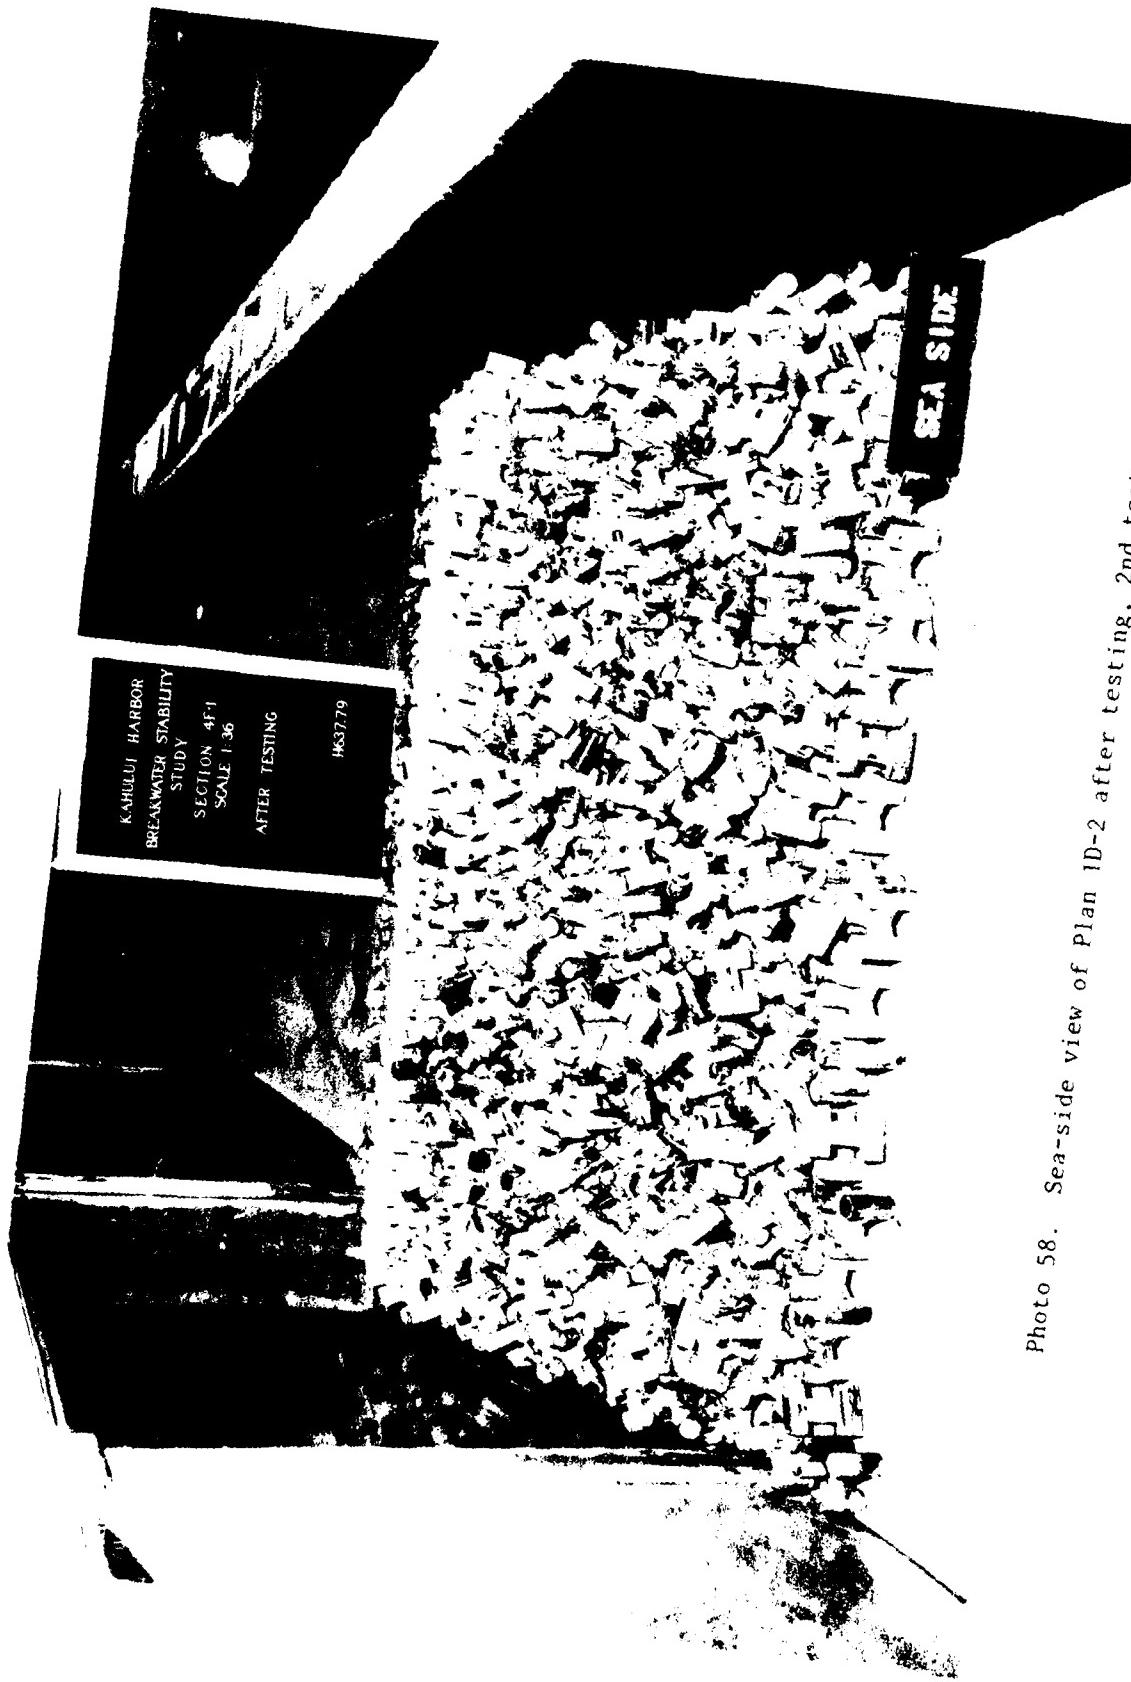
Sea-side view of Plan 1D-2 after testing, 2nd test
